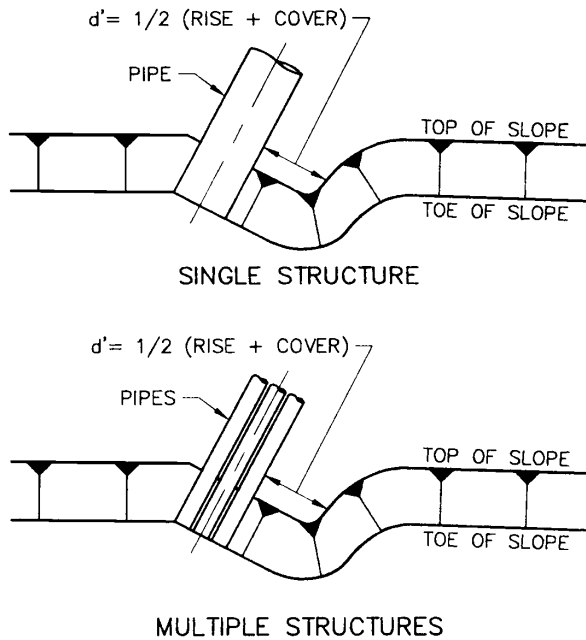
End Treatment of Skewed Flexible Culvert
